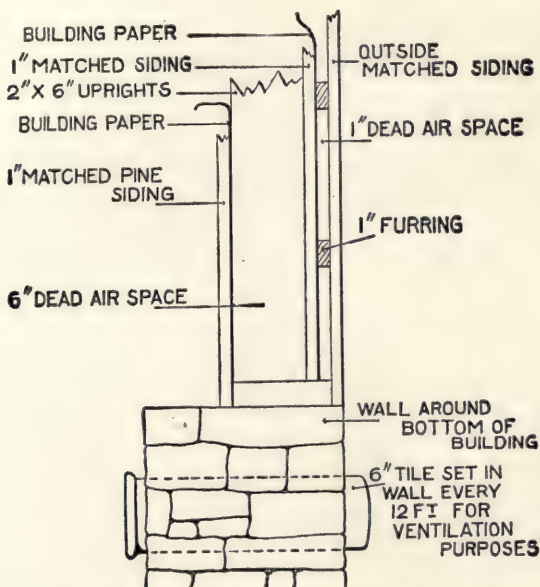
NEW YORK CABBAGE HOUSE, SHOWING WALL CONSTRUCTION
